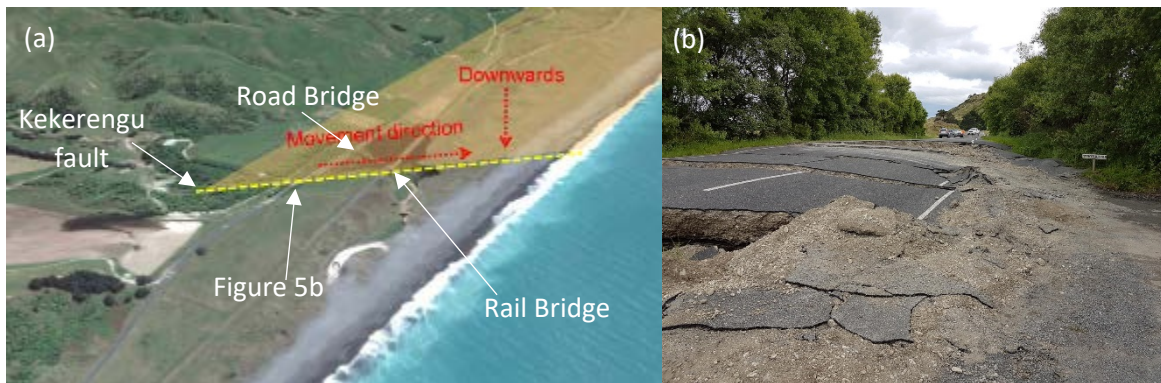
a) Strike-slip fault causing, ~2.5m downwards and 5m horizontal eastwards b) Road damage 185m away from bridge site (Photos courtesy of NCTIR)
